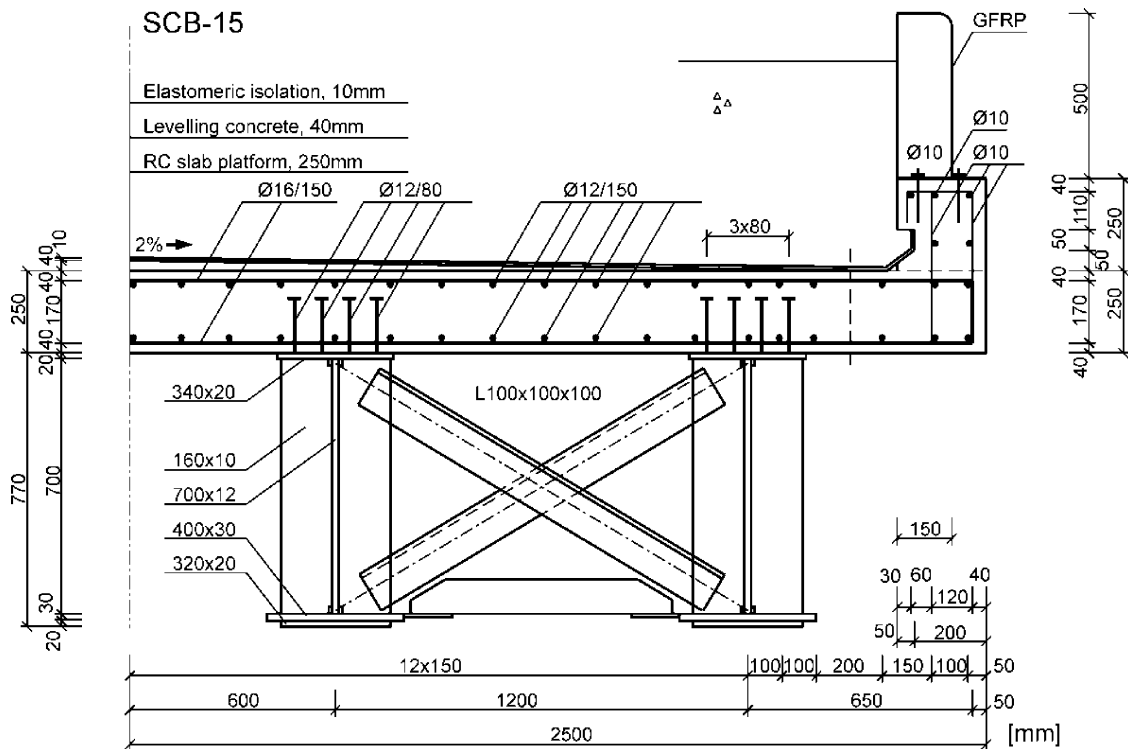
Cross-section of symmetric superstructure of SCB-15 bridge (main and structural reinforcement)
